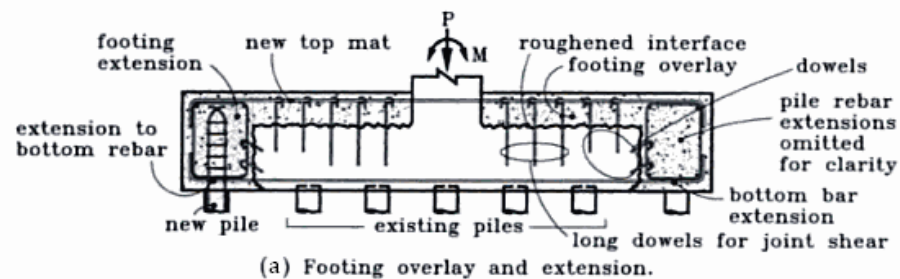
Footing retrofit measures (Adapted from Priestley et al. 1996).
